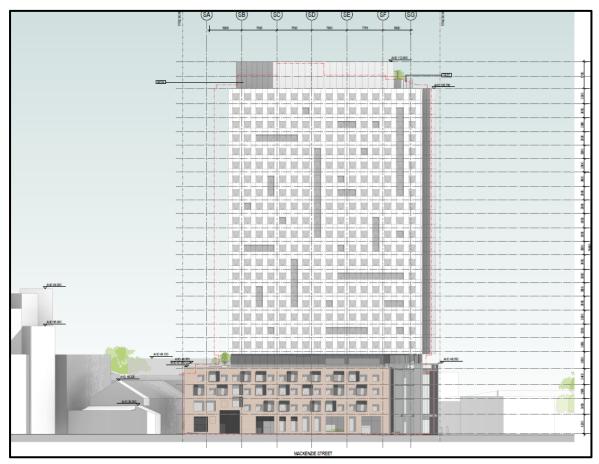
Excerpt from South Elevation (MacKenzie Street) (S.57A Amended Plans)
